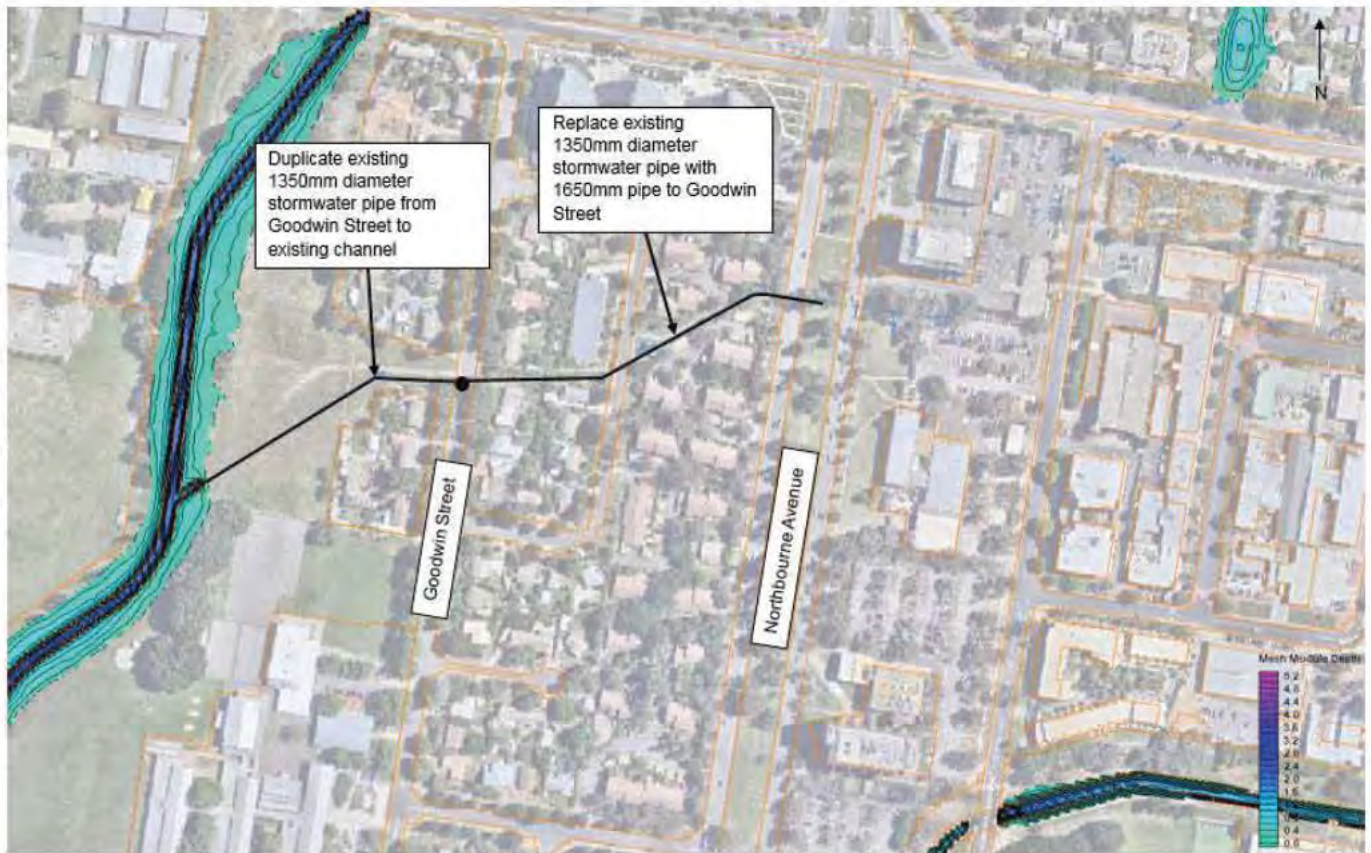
Upsizing and duplicating the 1350mm stormwater pipe
